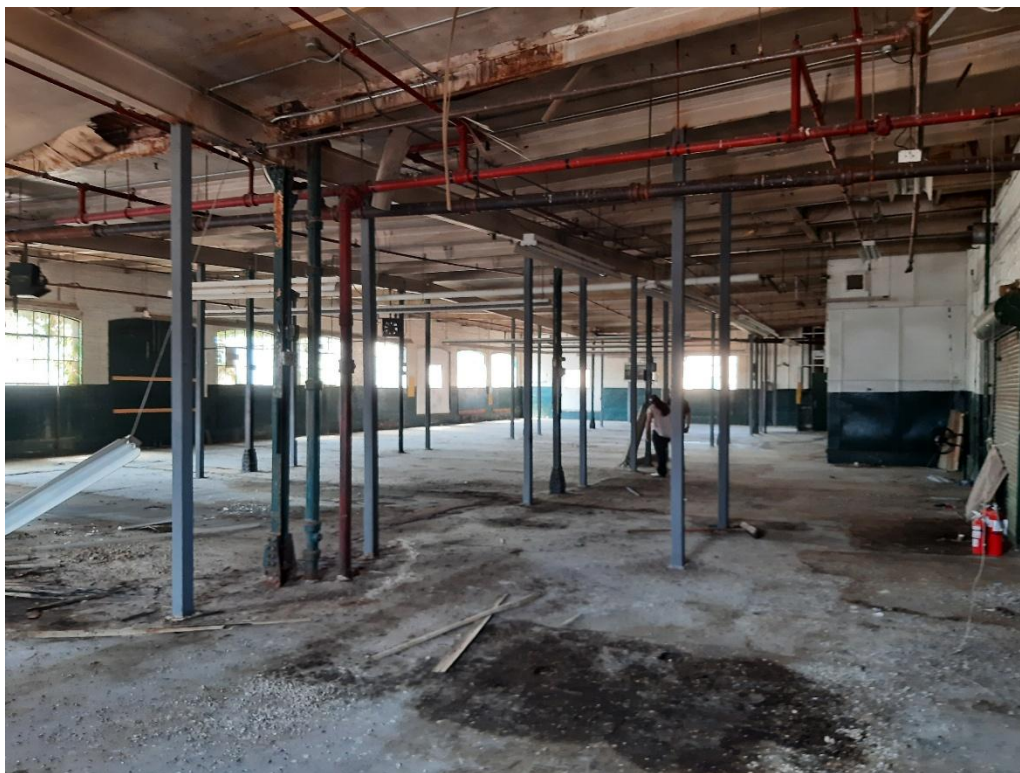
Overview of the 1913 Building with Addition on the Right
